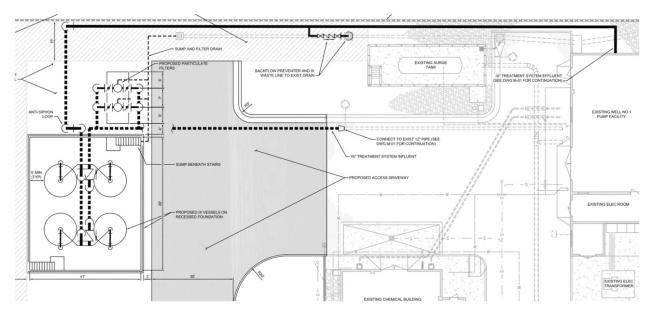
Pipelines Routes for Site Master Plan Alternative 1
